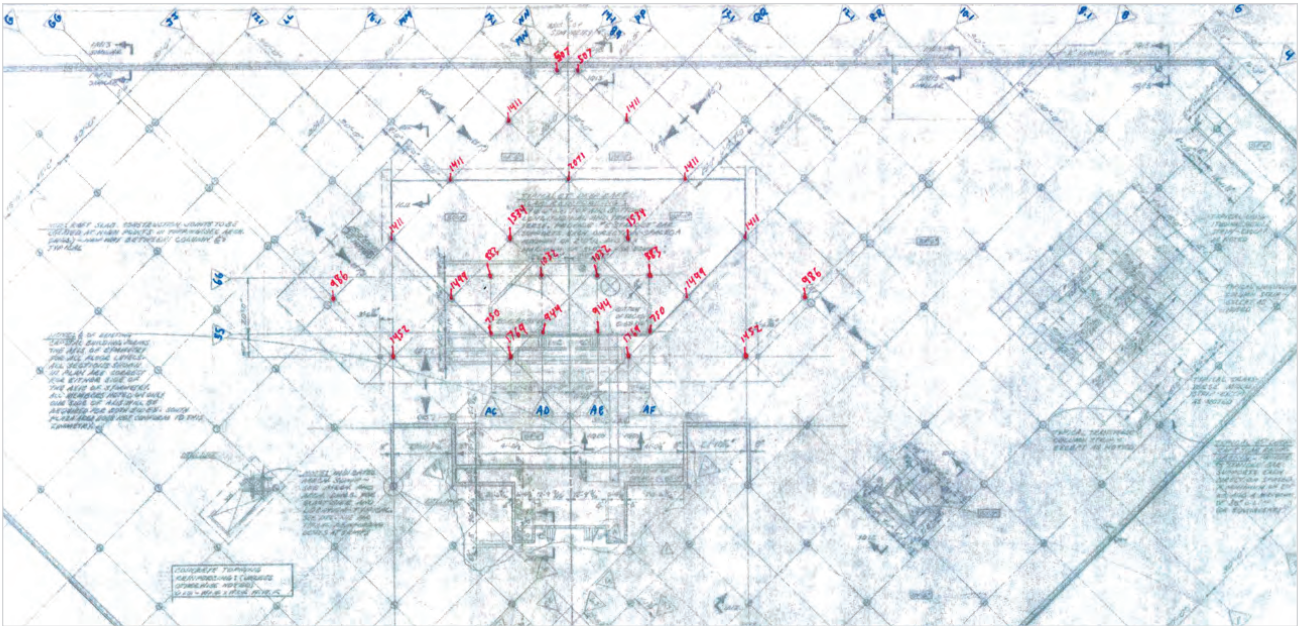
Potential addition column loads (in kips) and grids, as depicted on the original drawings.
